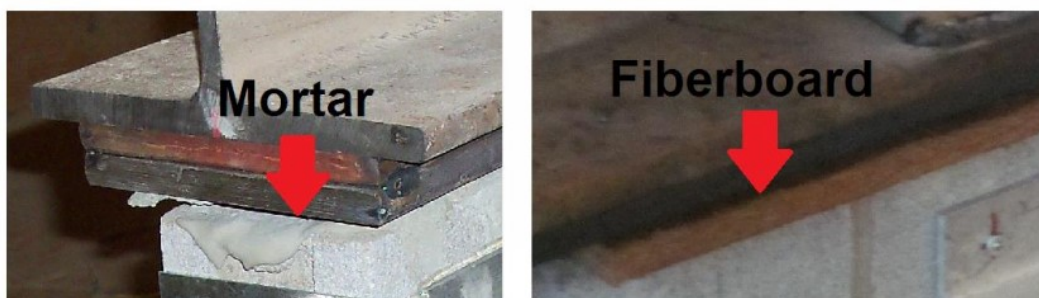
Interface between the specimen and loading beam by Hamedzadeh (2013)
